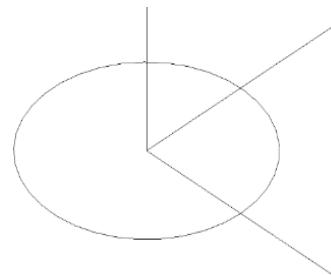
Origin linework that shows in both plan and 3D view of models. This marker should be in the site plan of the Construction Drawings for the project as the contractual definition of the Building Coordinates.
